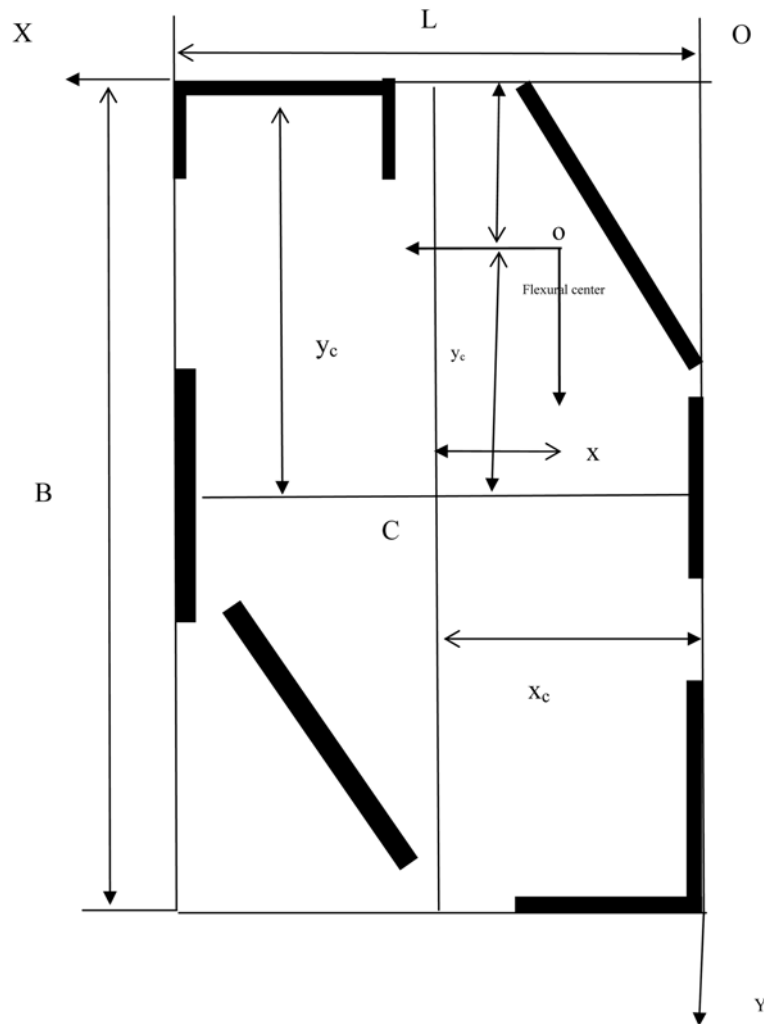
Plan of a general asymmetric shear wall and Thin Walled Structures
